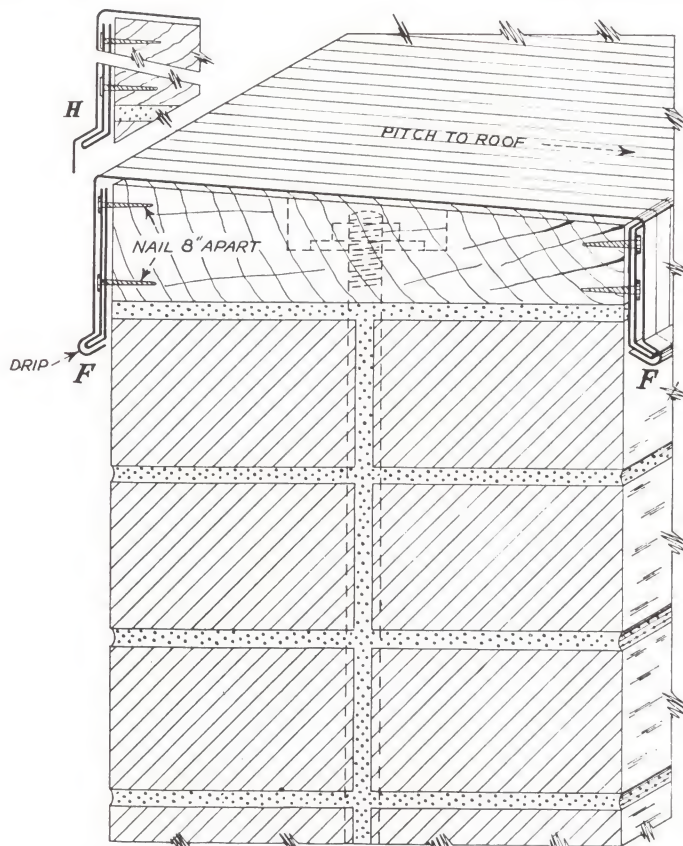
SHEET METAL COPING — ALTERNATE METHOD
